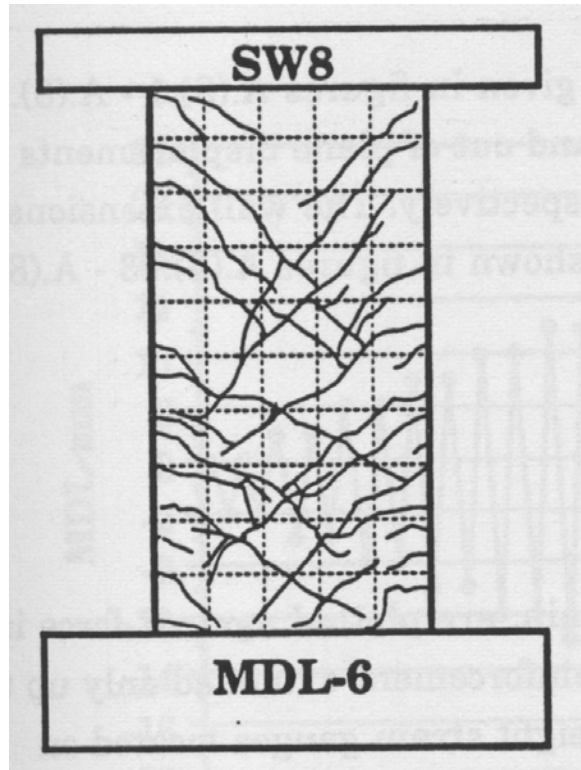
Condition of wall SW8 at 0.50% drift [Pilakoutas (1991)]
